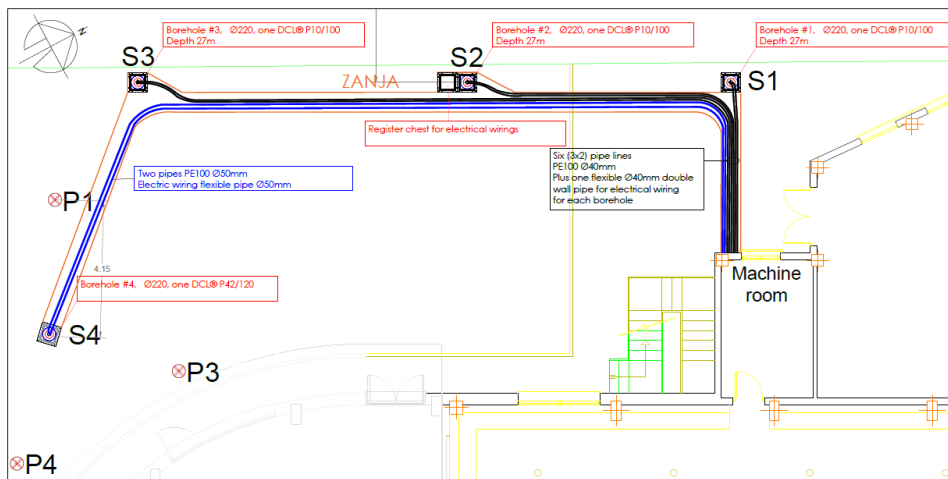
Floor plan of DCL-probes, plant room and connecting pipes.
